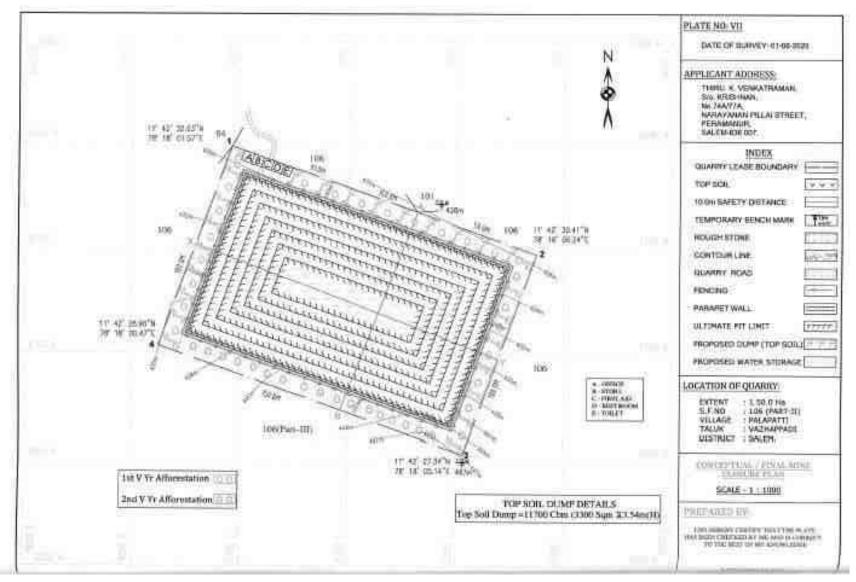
CLOSURE PLAN AND SECTIONS "P1"
